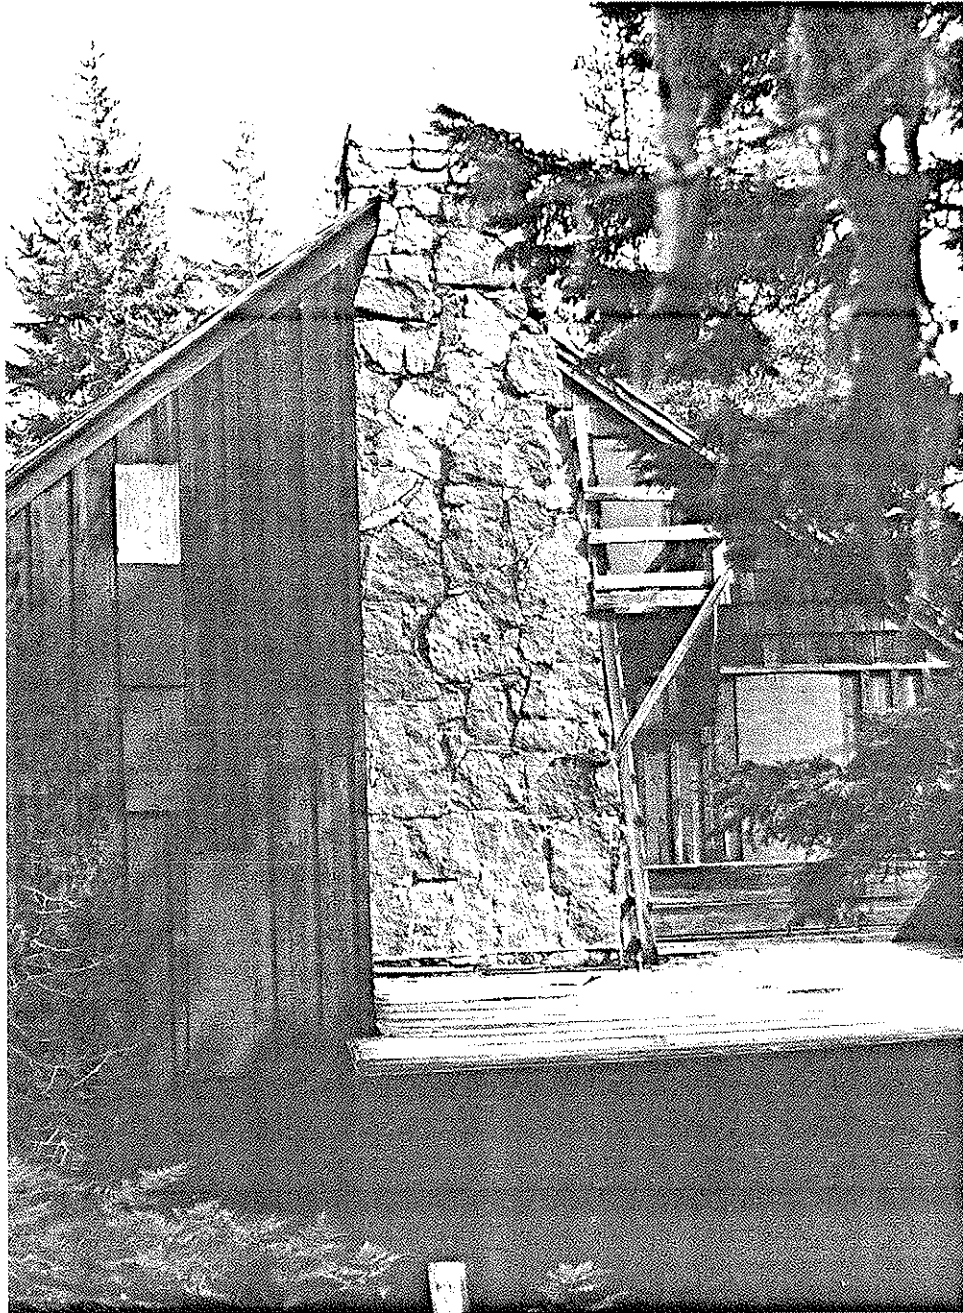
Santiam Lodge. West elevation of main structure showing chimney, enclosed stairwell (left), and roof of the wood storage area (lower right). October 1988.
